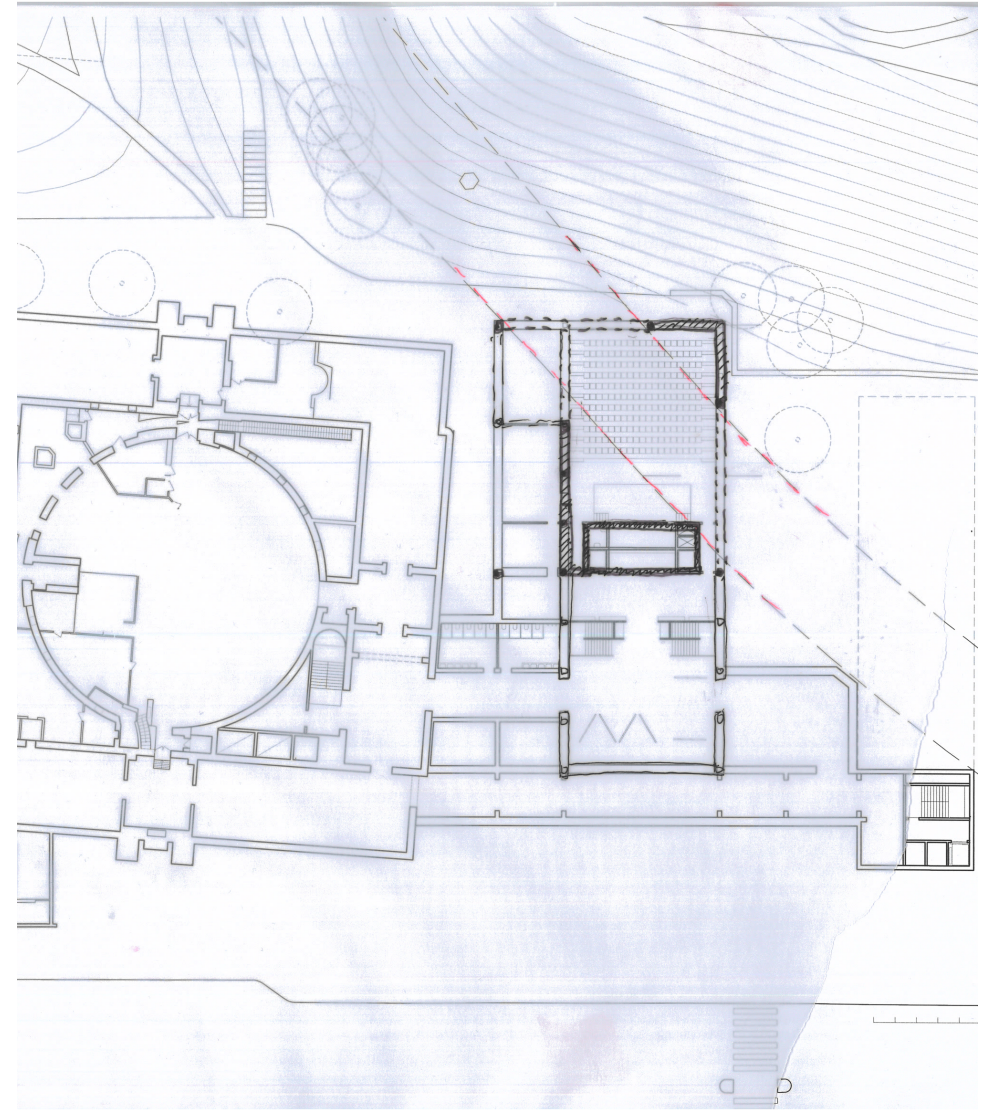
Plan of basement showing the presence of the metro tunnel. Made by author.
